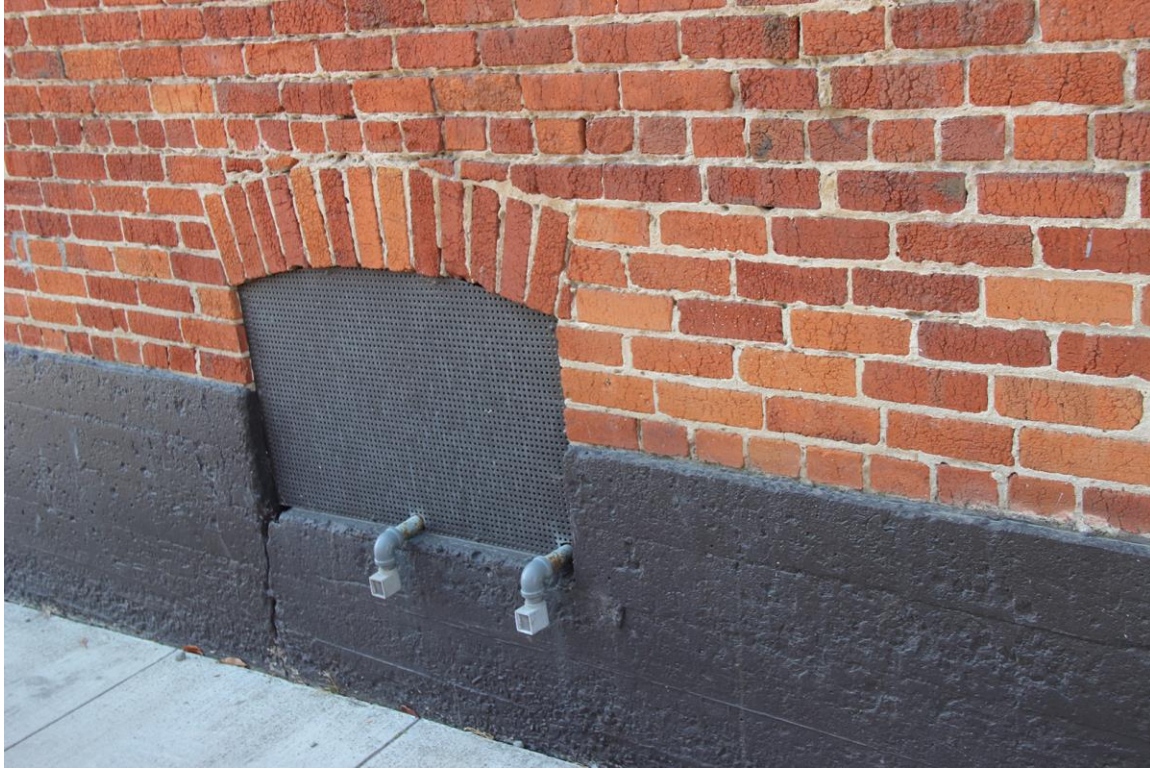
Detail of concrete foundation and basement window facing 19th Street.
